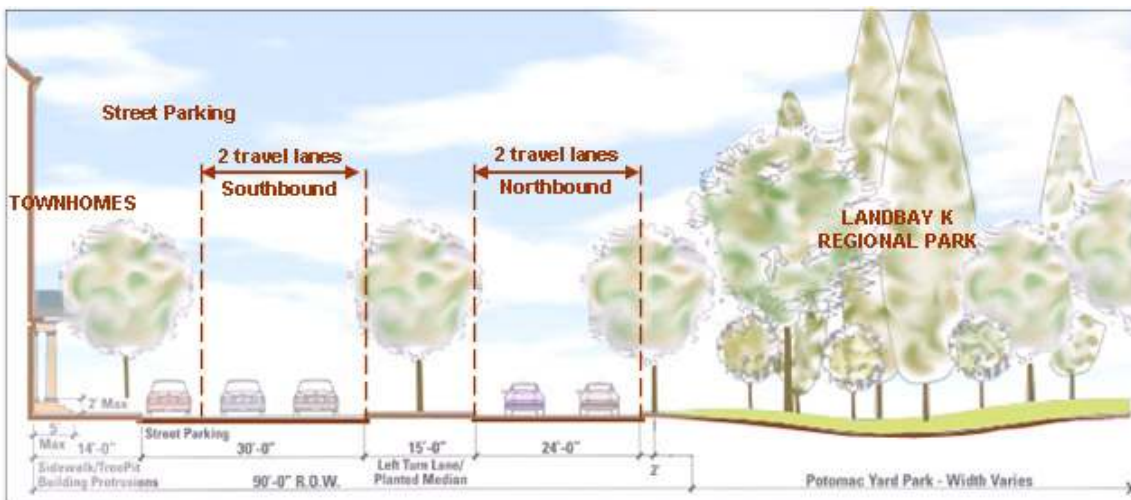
B. Looking North - Potomac Avenue in the PYD section of the Yard
